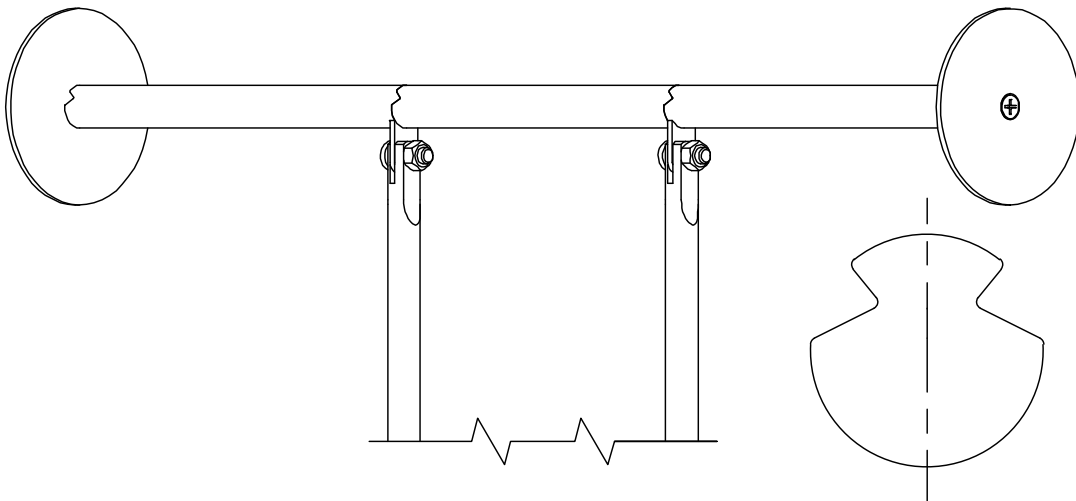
Schematic of the Clean Contact Wire Setup with End-plates
